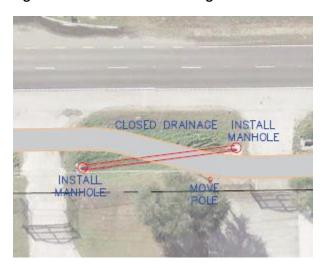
Modification to Alignment to Minimize Impact to Existing Swale
